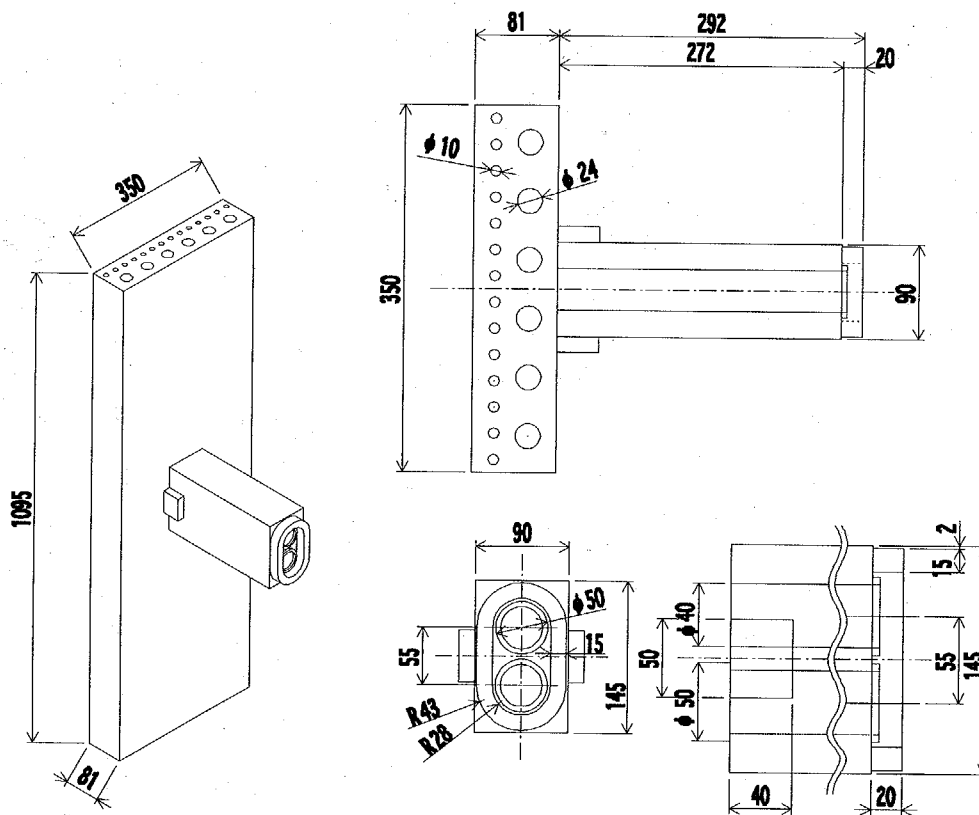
FW supporting beam (racetrack welding, beam length 292 mm)
